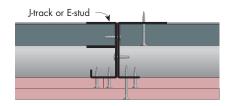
Section B-B System KSHW1/3 Example only - Plan view
